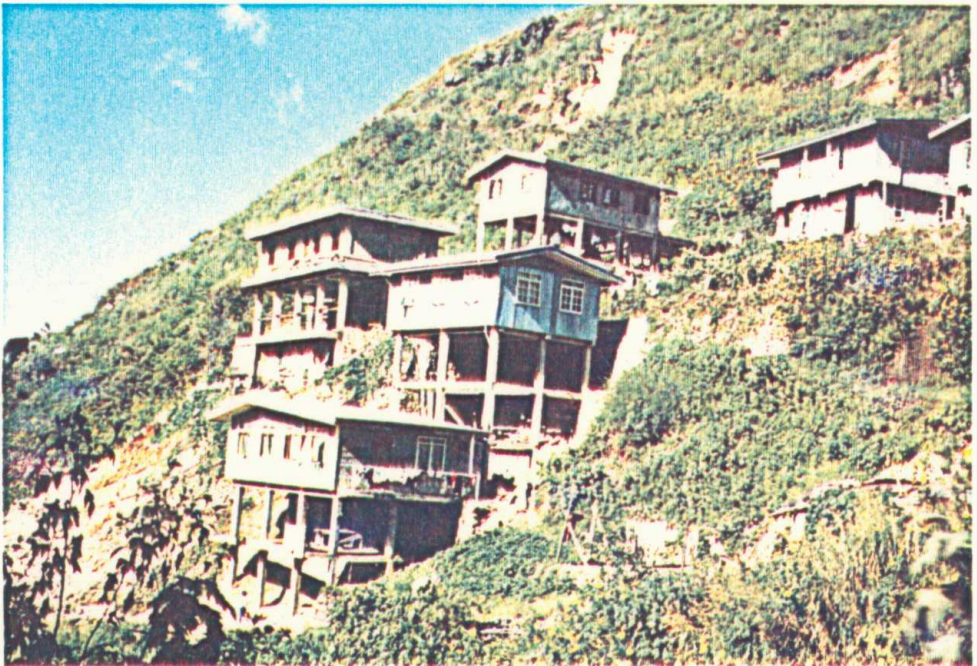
Houses built on the slopes in La Trinidad with high damage potential and progressive failure.
